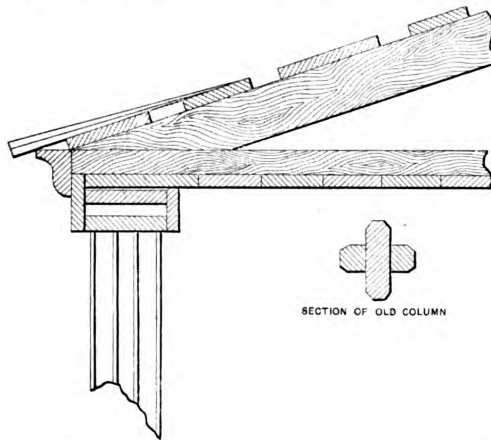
Section of Old Column, Showing Construction of Roof.
